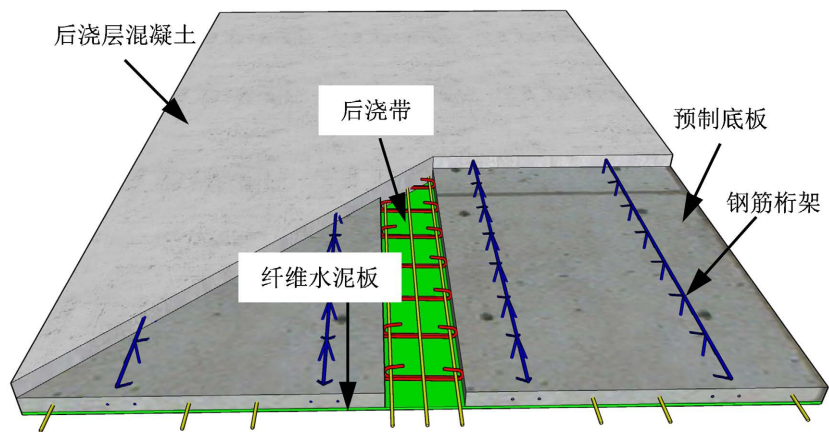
Prefabricated reinforced truss concrete composite slab construction with base plate
